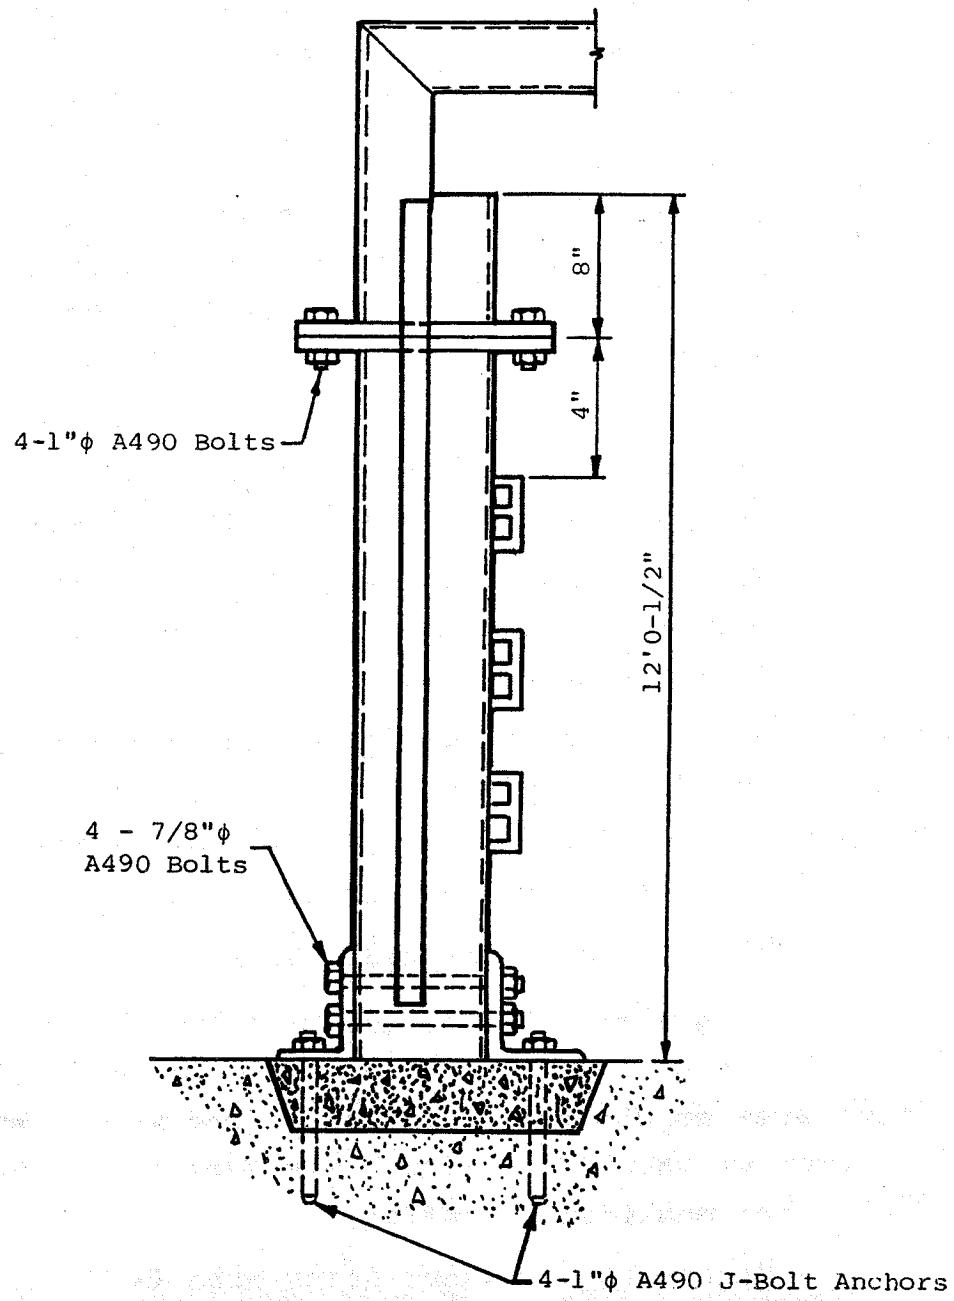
Milan 81-mm Suppressive Shield Removable Column
